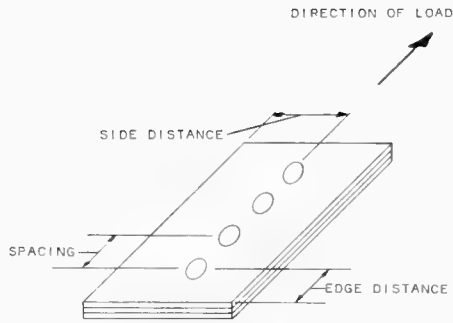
Edge and Side Distances and Spacing for Bolt Type Fasteners
